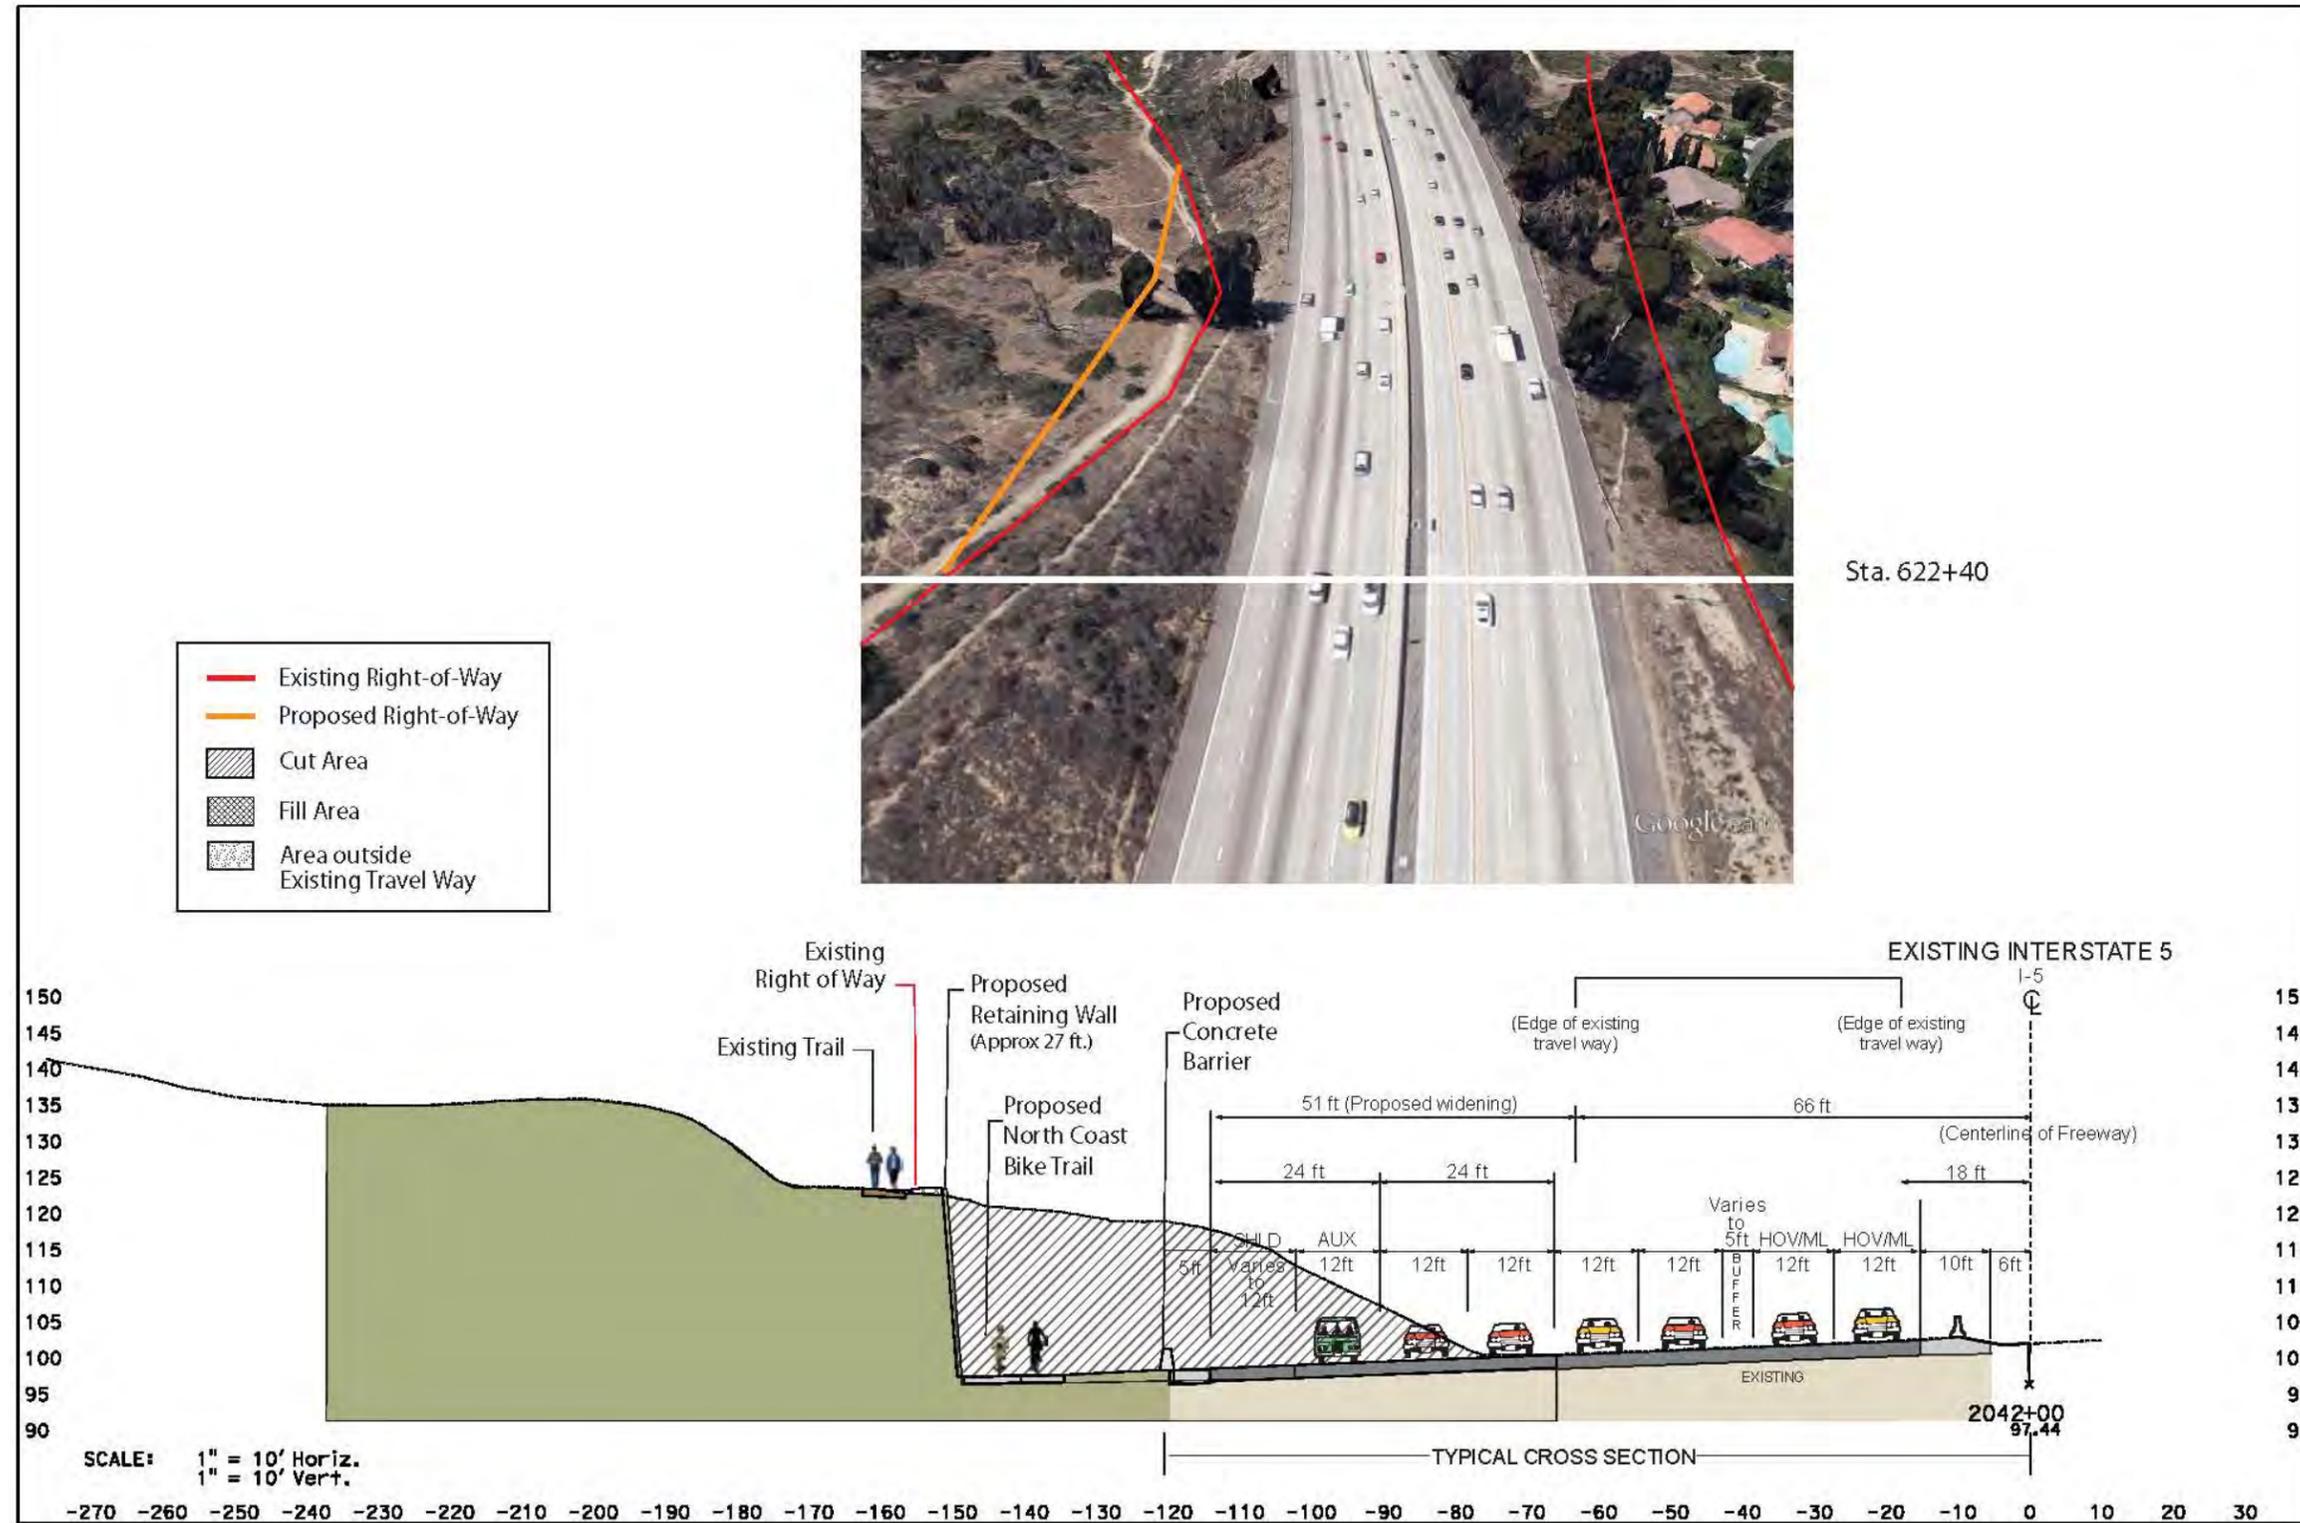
Preferred Alternative Cross Section at Sta. 622 + 40
